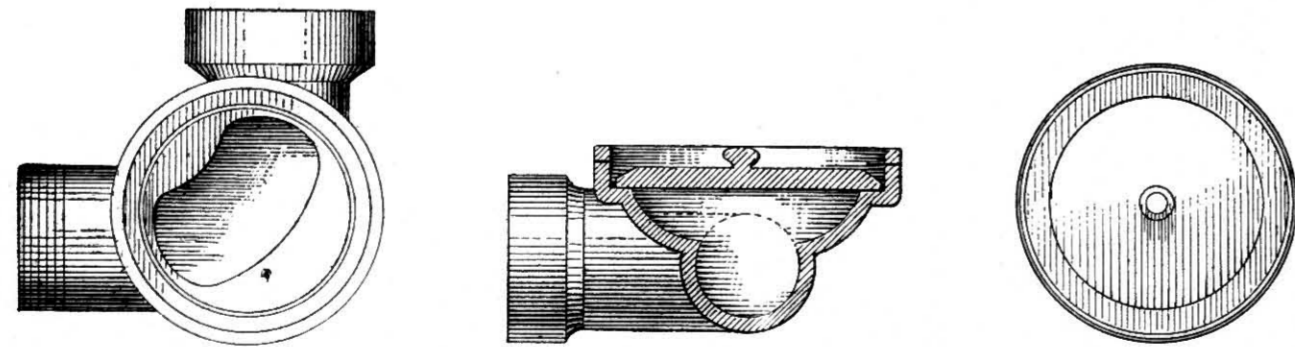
Plans and Section of "Tron" Inspection-eye for Bend.
